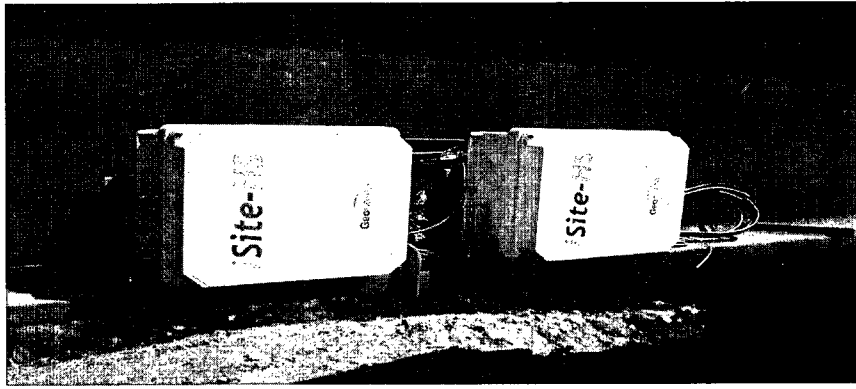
Installed iSite boxes with completed cabling, angle mounting, and c-clamp installation
